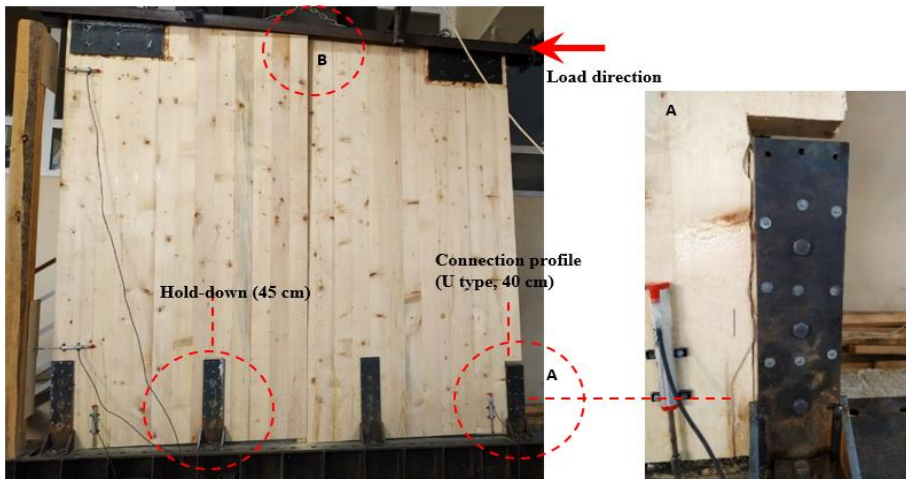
CLT wall to foundation Detail-4 and deformation of connections
